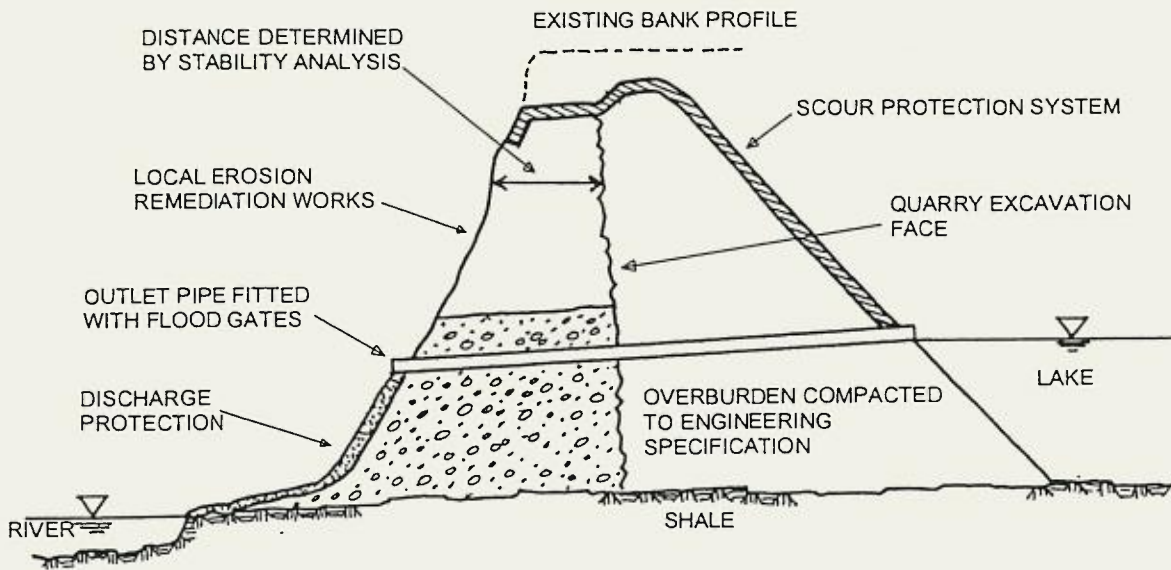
River-to-Lake Weir - Typical Section (Weirs 2, 3, 5 and 7)
